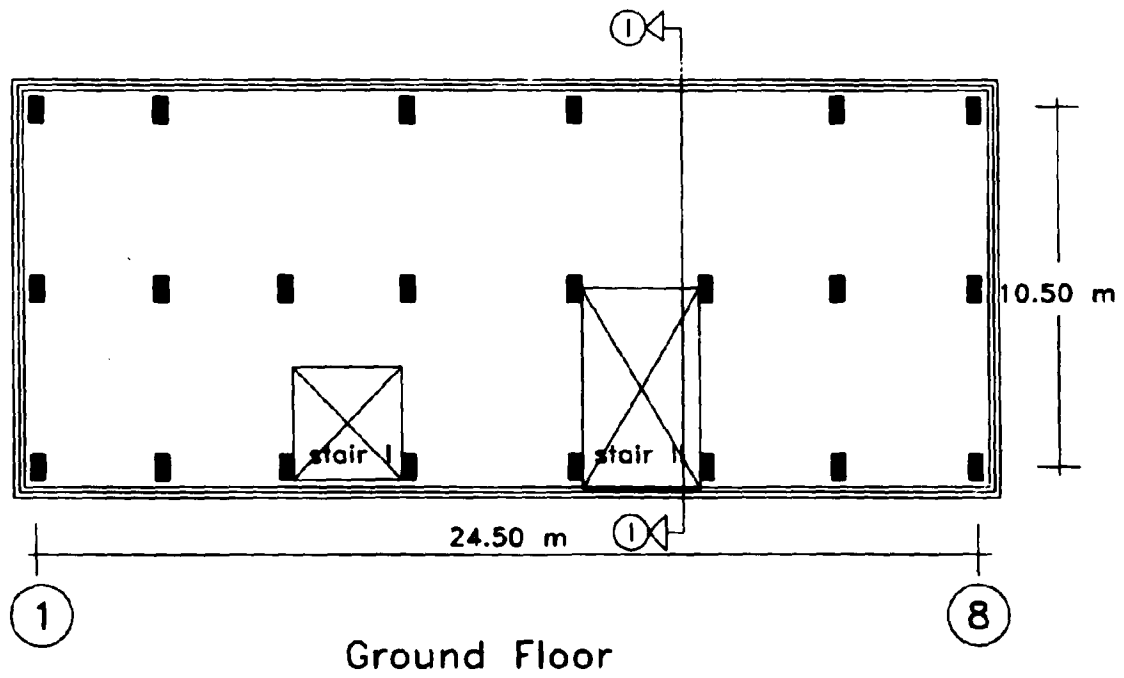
Section of Ground Floor and Location of Columns in Shantou Demonstration Building
